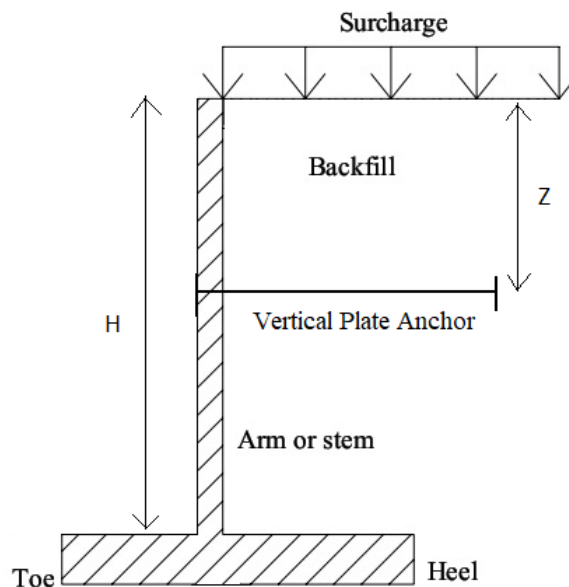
Cross section of cantilever retaining wall used in FEM
